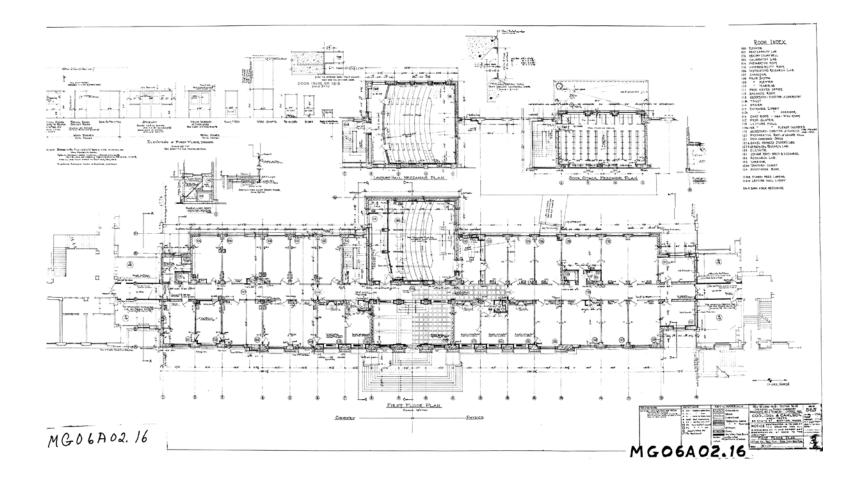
First Floor Plan. The large lecture hall protrudes from the constant width of the building.
